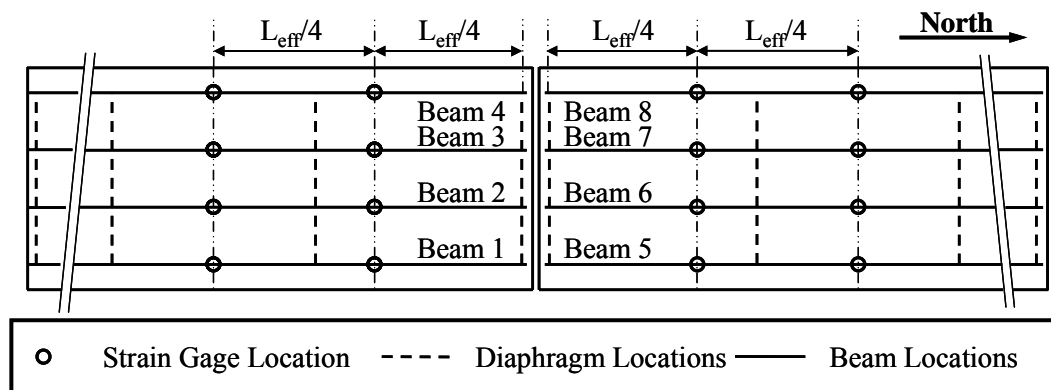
Instrumentation Plan for Lampasas River Load Tests
